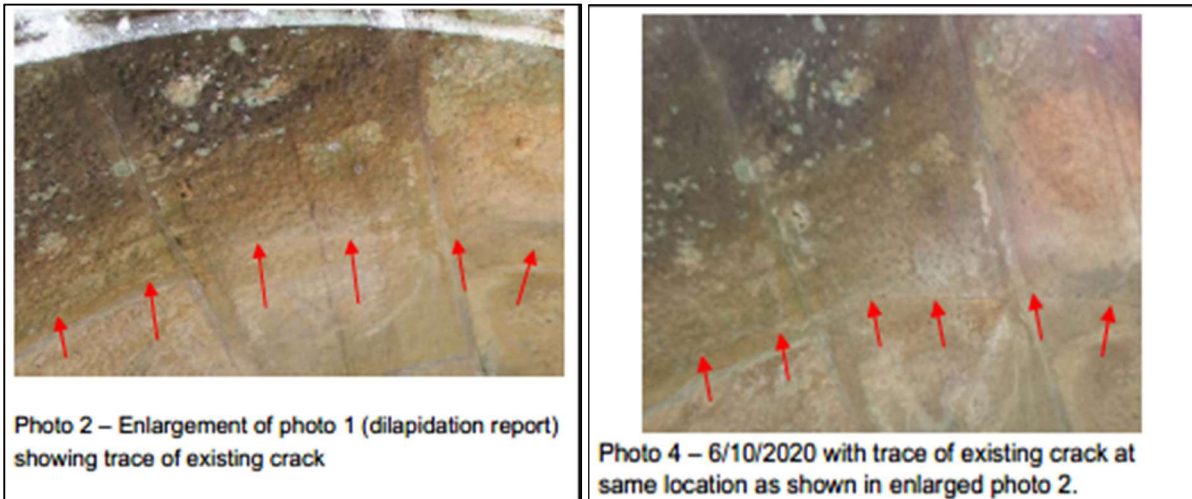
Pre-mining and current photos of the crack at culvert 89.629 km (source: PMLL Detailed Monitoring Report 47, Appendix E).
